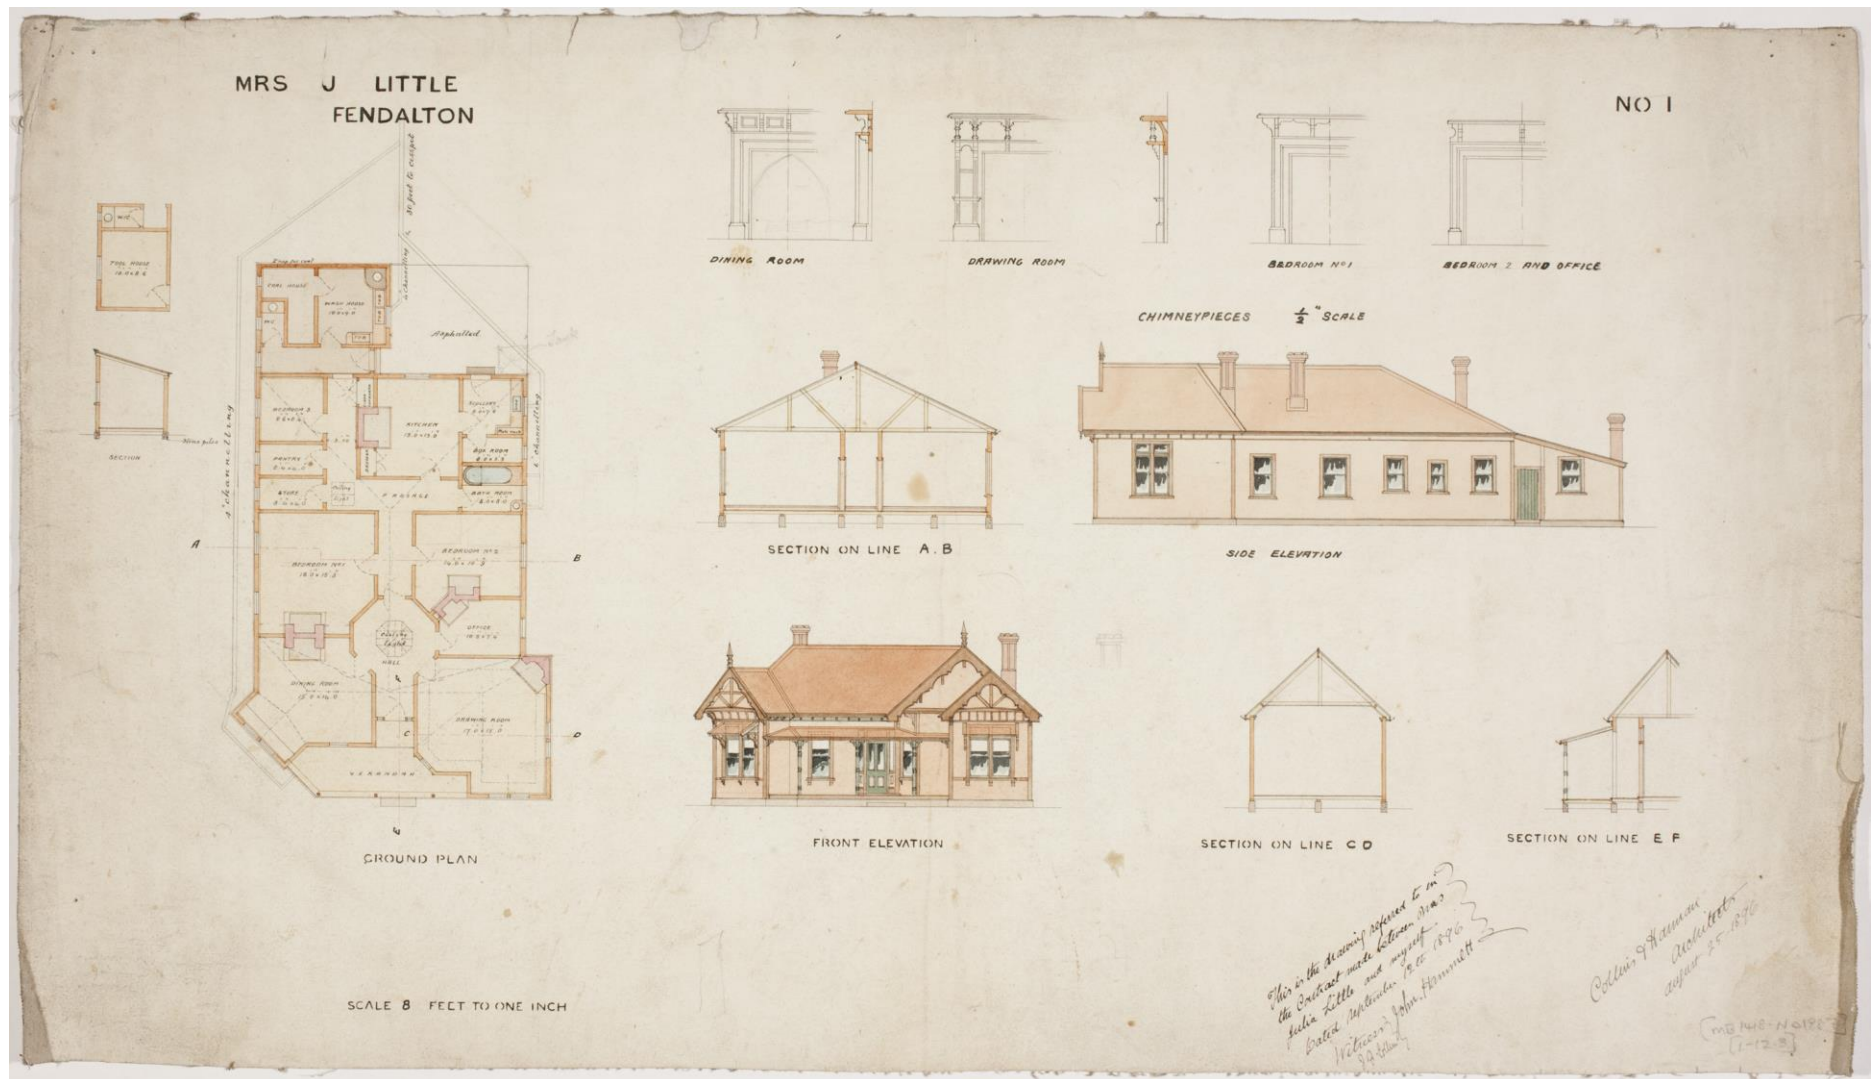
Collins and Harman, Mrs J. Little, Fendalton, plans, elevations, and sections (1896).
